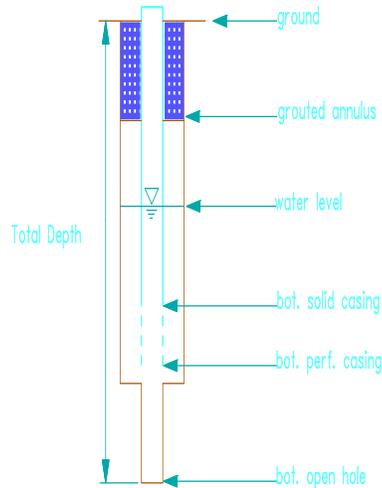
WATER USE PERMIT DETAILED INFORMATION
